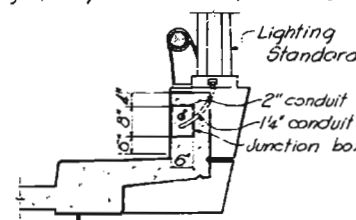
DETAIL AT JUNCTION BOX AND LIGHTING STANDARD
